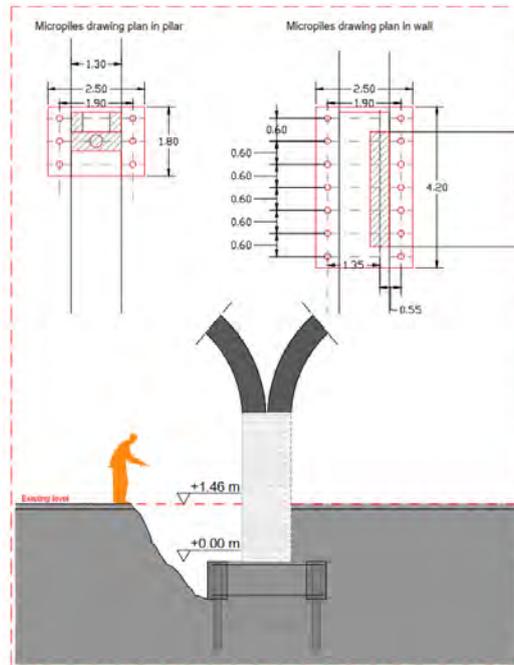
Elevation showing excavation to the base of the pile cap (below) and plan of two foundation types (above)
